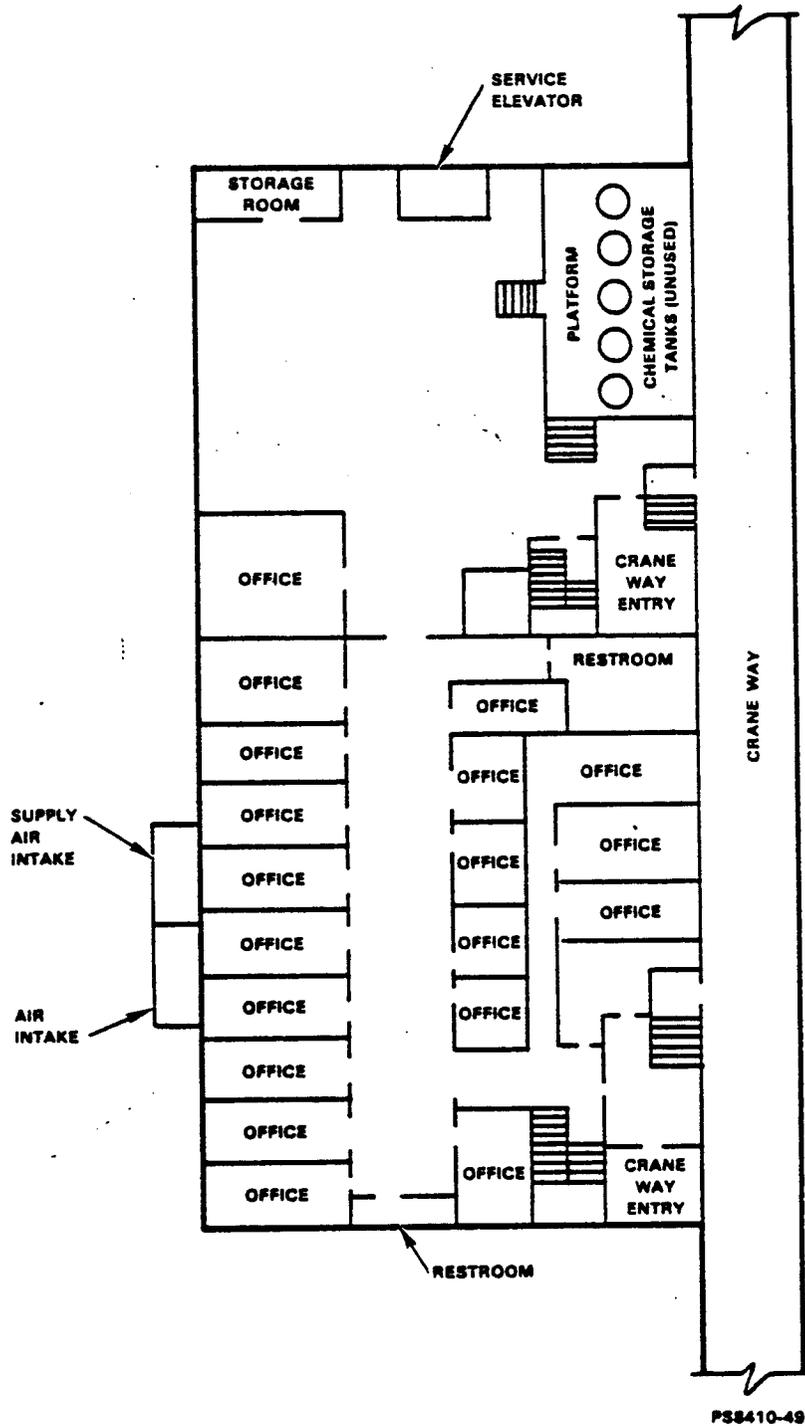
Building 271-T, Third Floor Layout.
